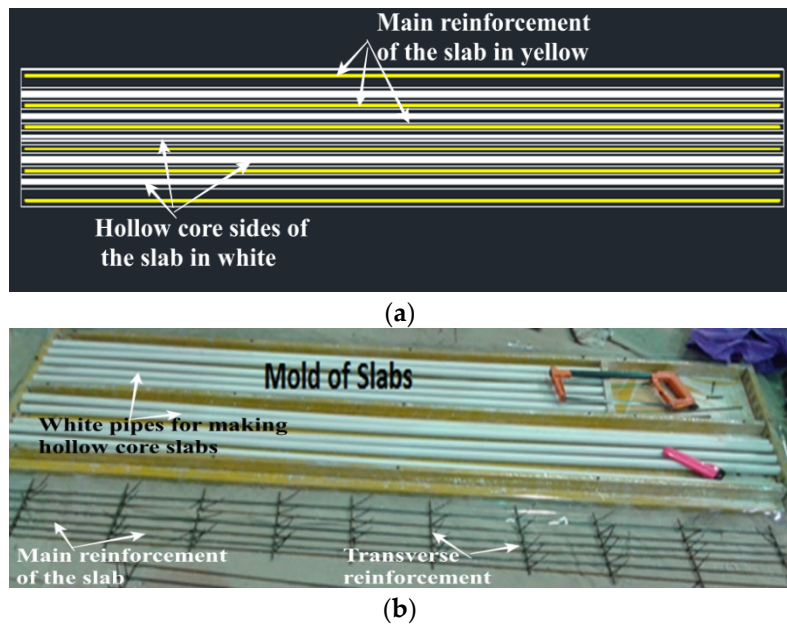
Details of slabs reinforcement: (a) AutoCAD drawing; (b) laboratory experiment.
